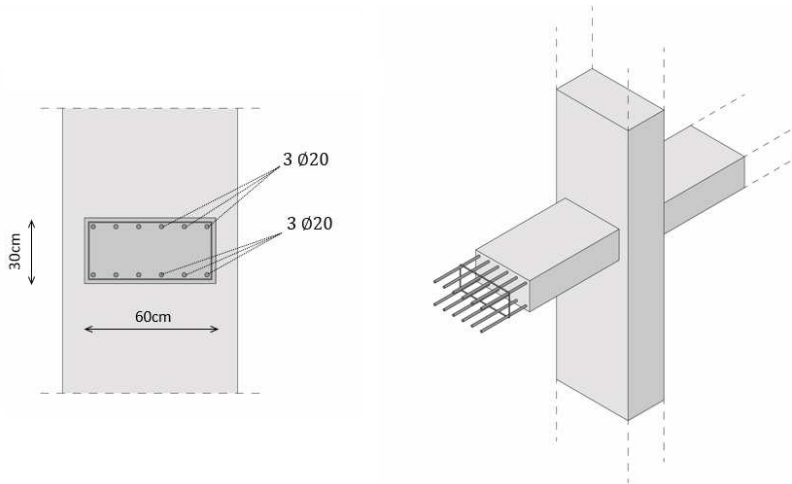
Column-longitudinal beam joint: beam cross-section (left) and 3D view (right)
